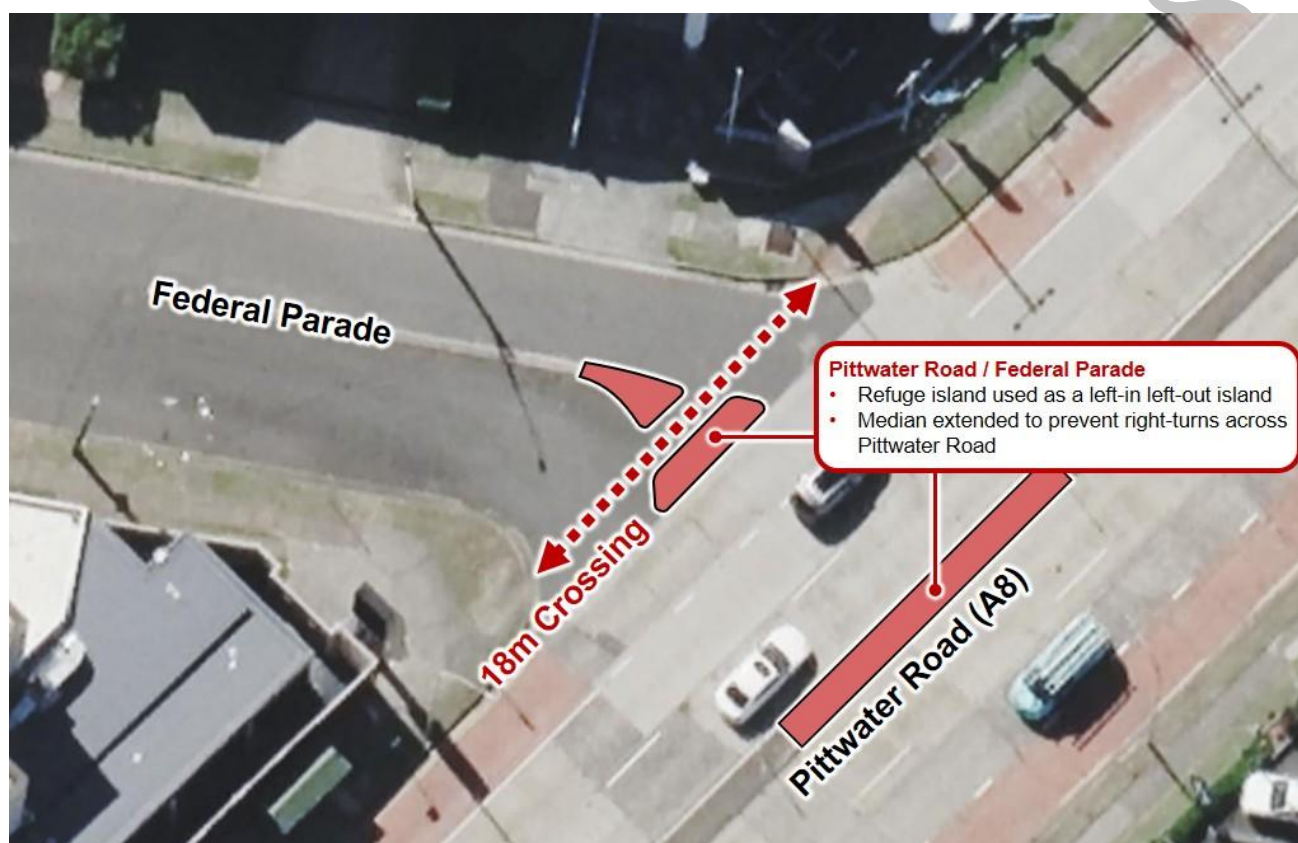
Example Pedestrian Crossing Facility – Pittwater Road / Federal Parade
